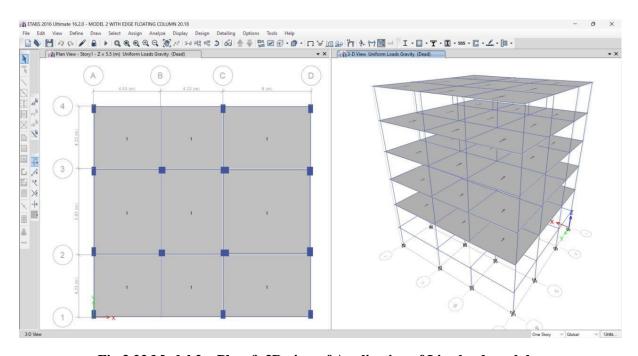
Model 2 – Plan & 3D view of Application of Live load on slab
